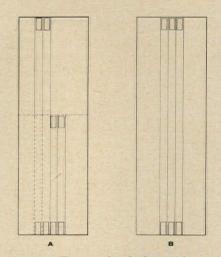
Express-local plan (A)—two express and two local elevators—may offer better service at no substantial cost increase over three local elevators (B). Plan A needs less hoistway construction at upper floors, one-third fewer hoistway entrances
